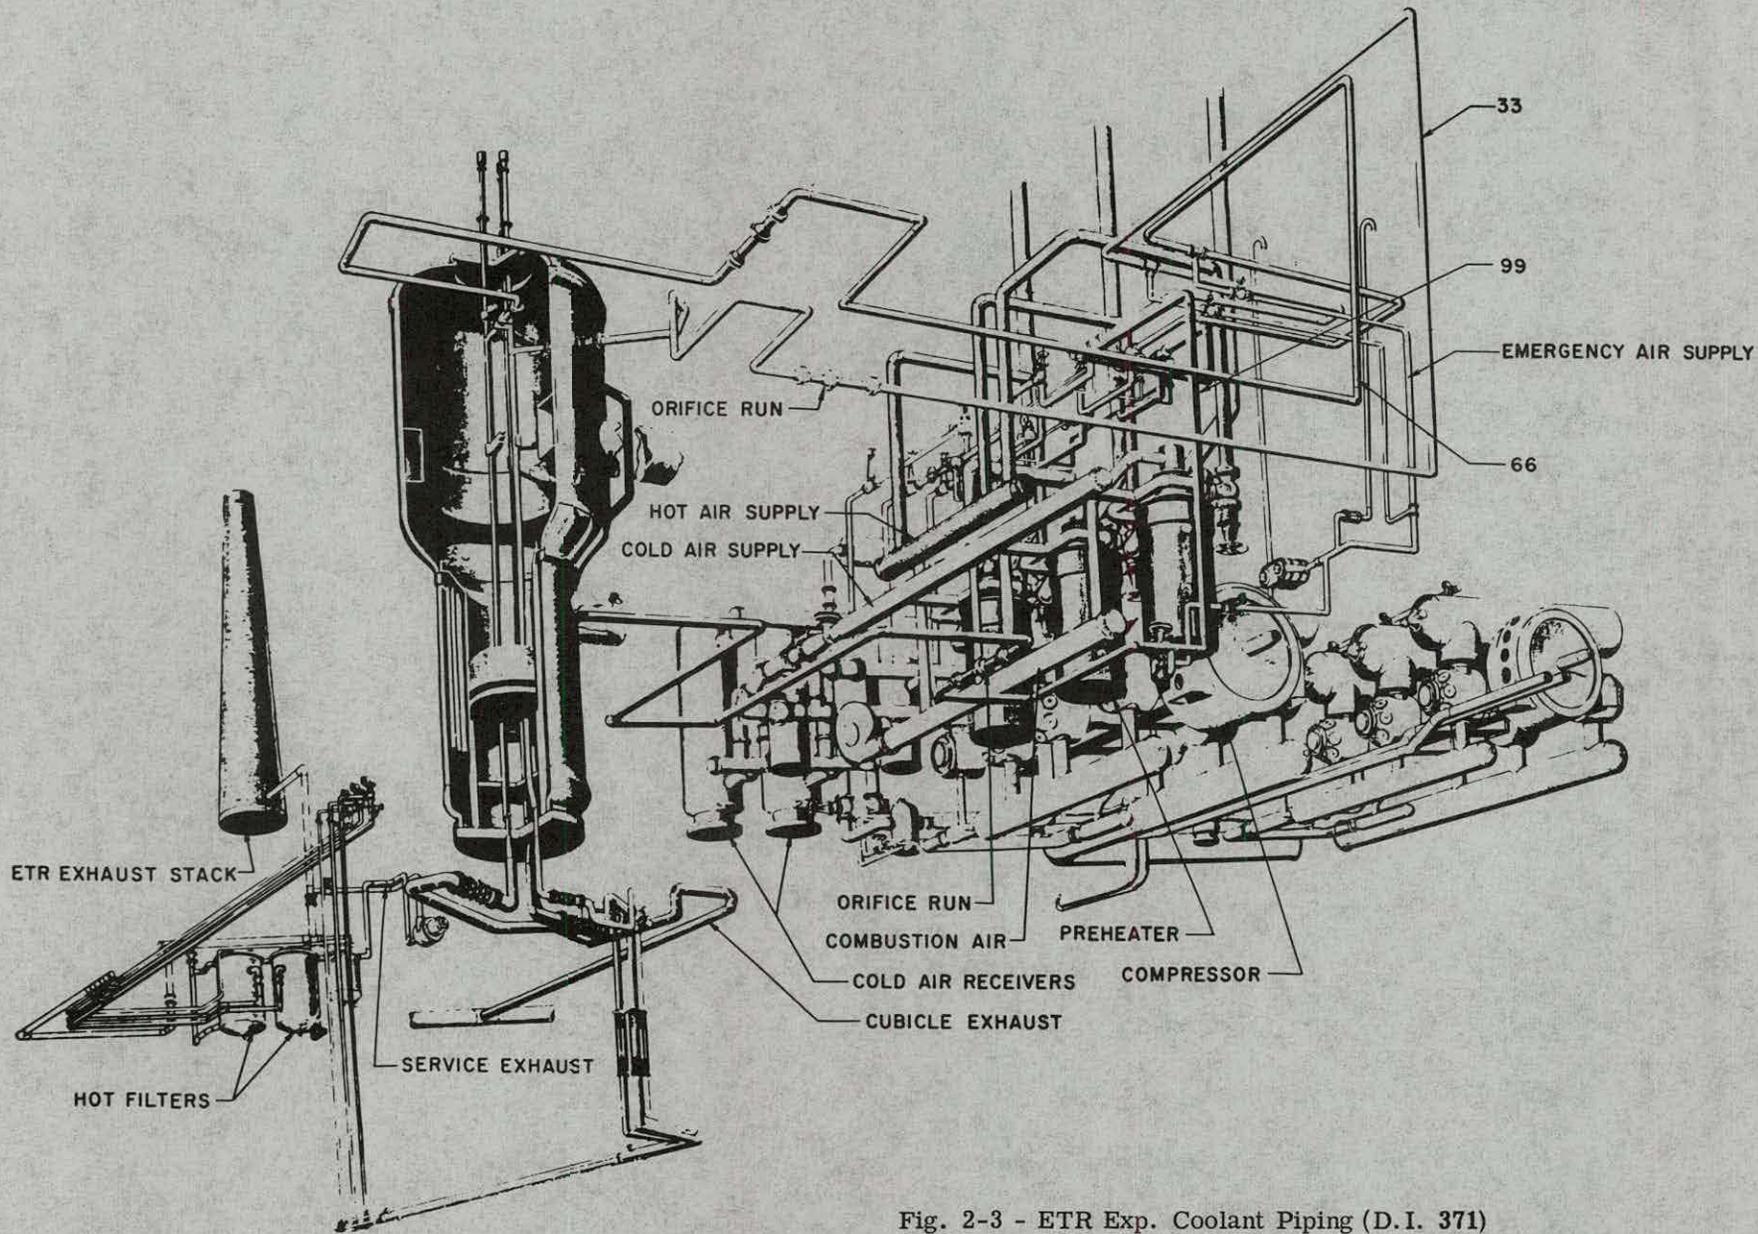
ETR Exp. Coolant Piping (D.I. 371)
